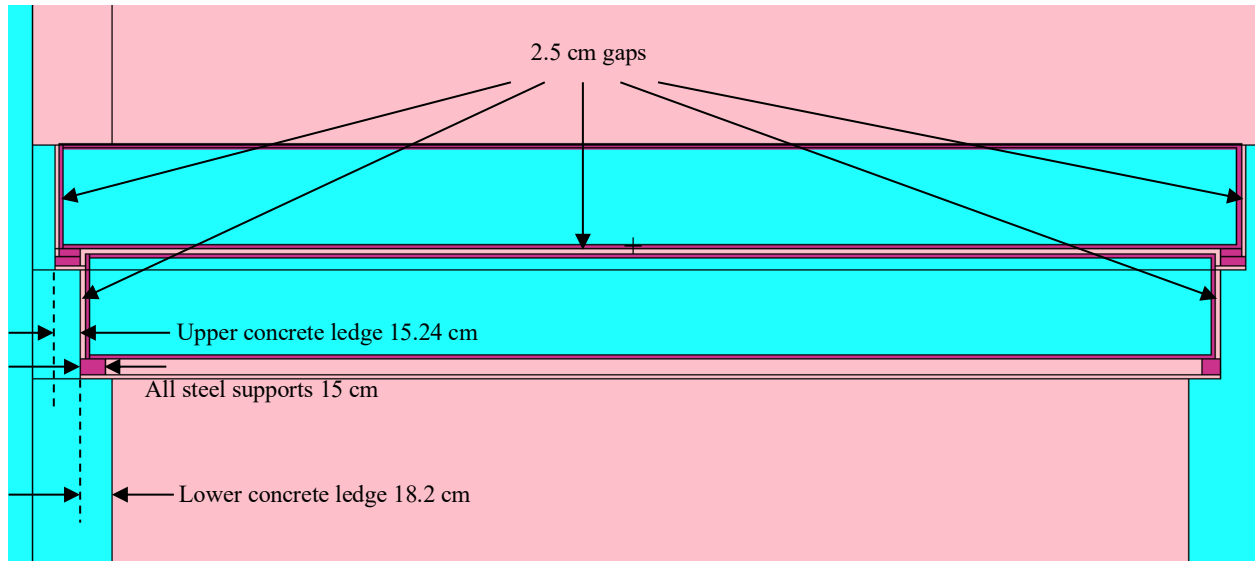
Details of the ledges on the monolith and bunker wall that support the bunker roof panels (ZX plane).
